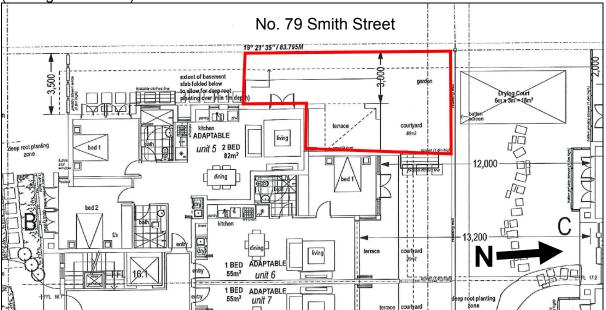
Private open space of Unit 5 Building B. Red line denotes private open space.
